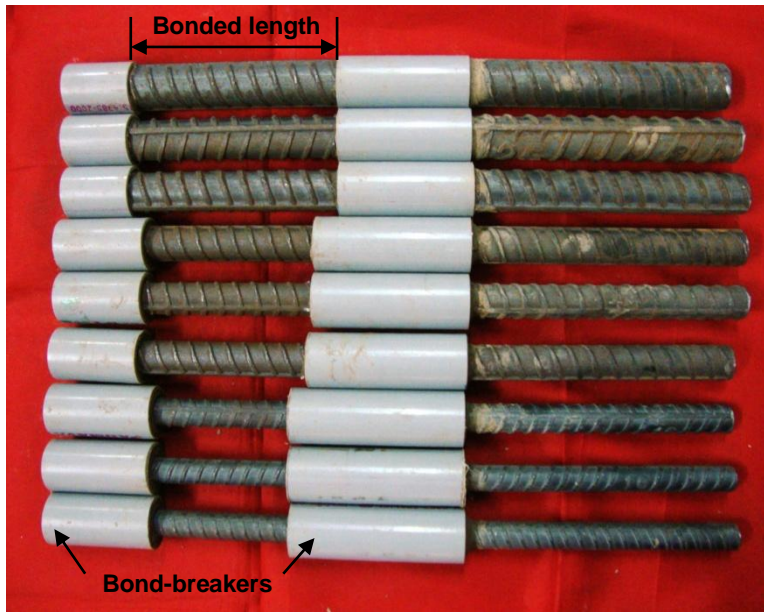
Typical rebars fixed with plastic tubes as bond-breaker
